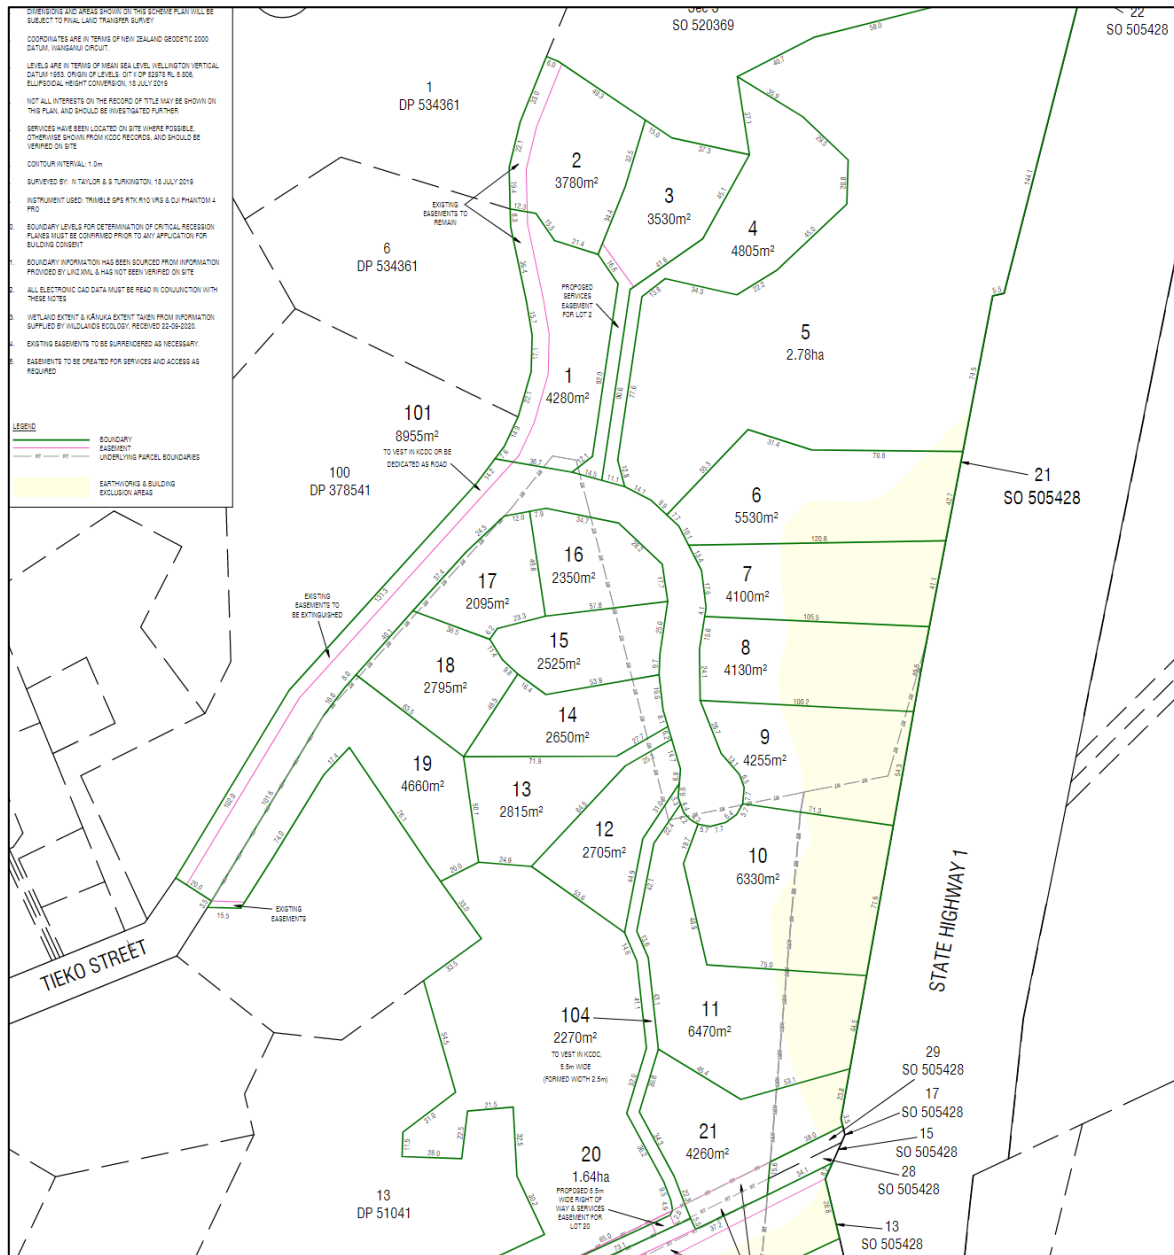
Scheme plan of the proposed lots accessing from Tieko Street
